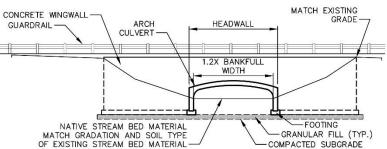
Typical detail of an open arch culvert designed to meet the MA River and Stream Crossing Standards.
